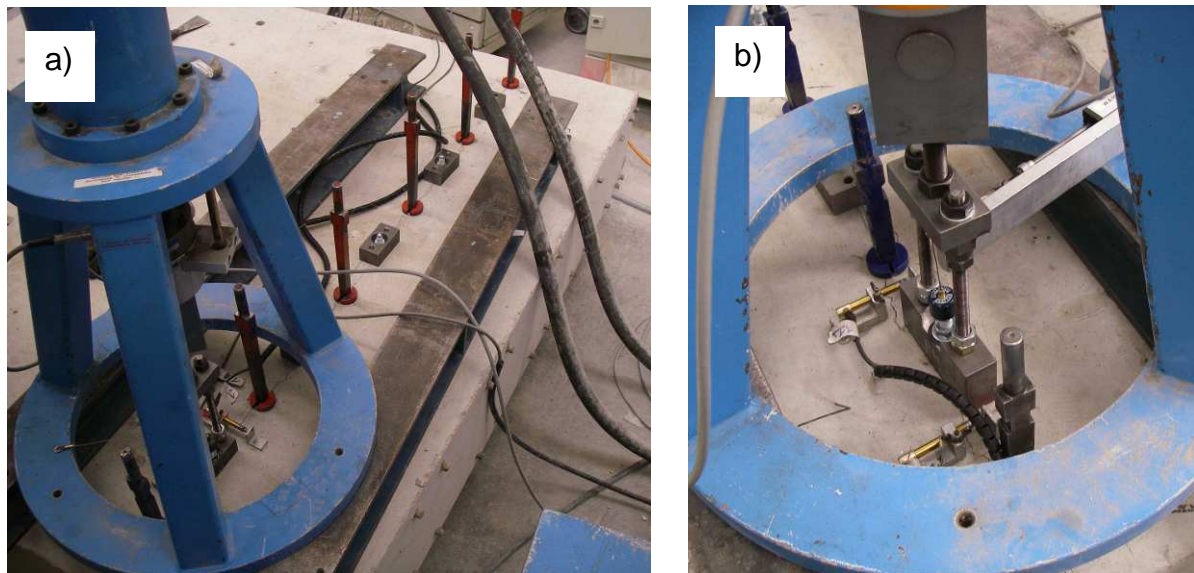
a) Actuator resting on wedge-split concrete slab; b) Close-up of installed anchor, fixture, anchor displacement and crack width transducers
